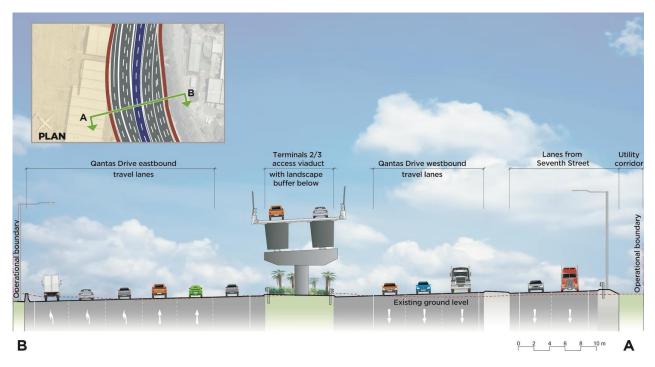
Qantas Drive upgrade and extension with Terminals 2/3 viaduct west of Robey Street – cross- section (looking south)
